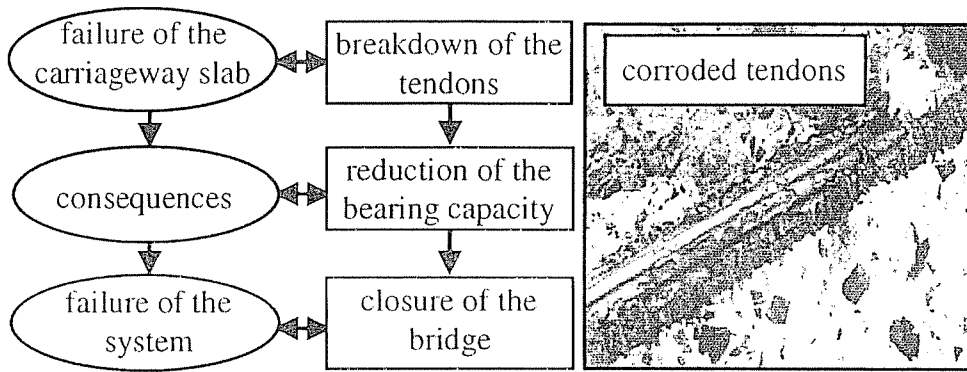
Example of a failure analysis related to a bridge superstructure
